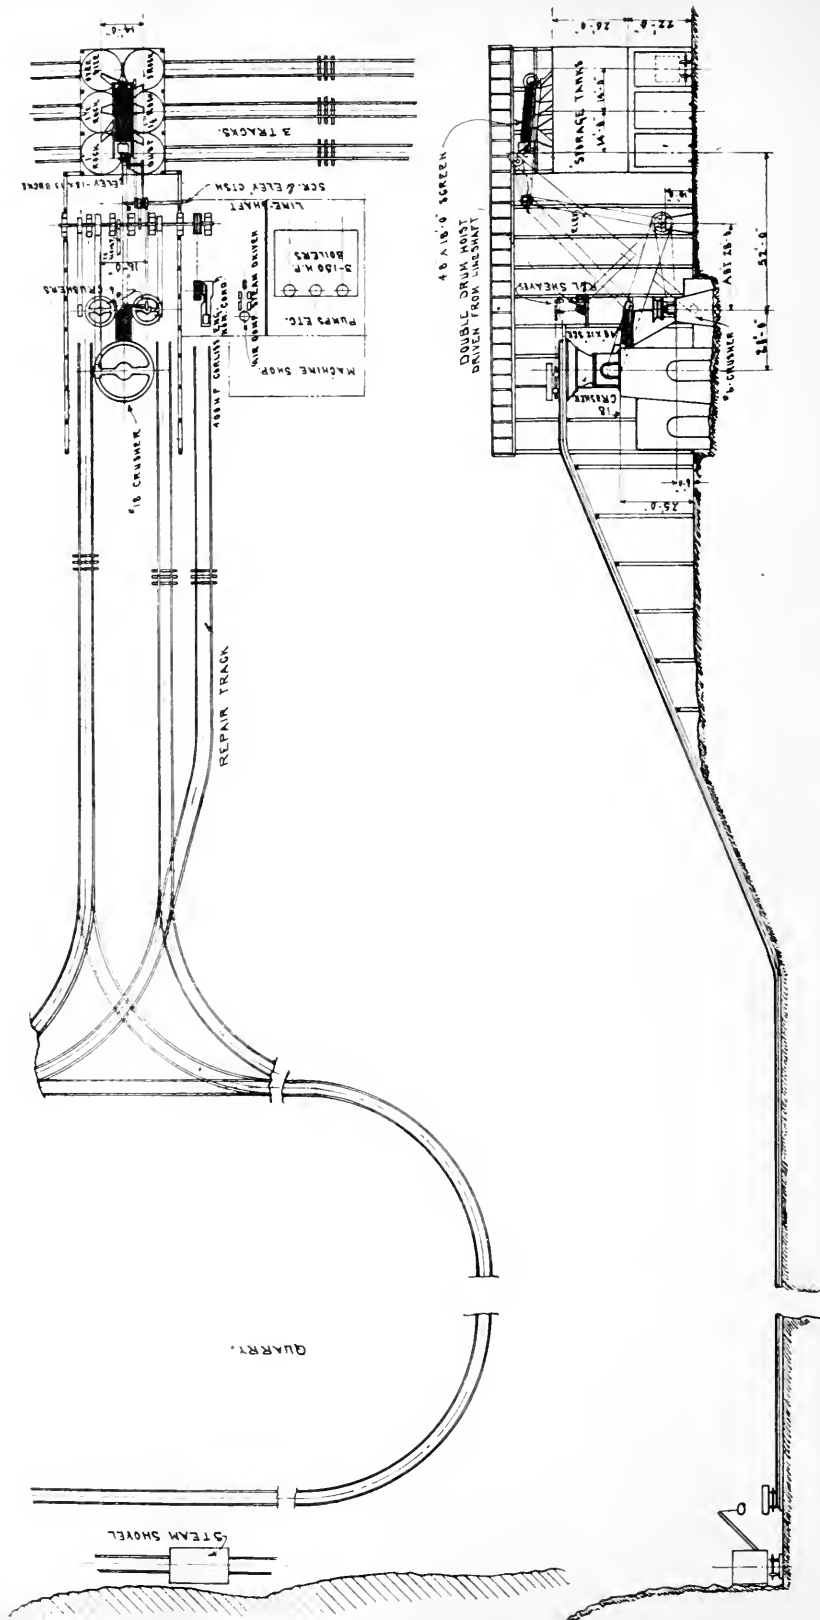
PLAN AND ELEVATION OF CRUSHING PLANT WITH NO. 18 AND TWO NO. 6 CRUSHERS.
